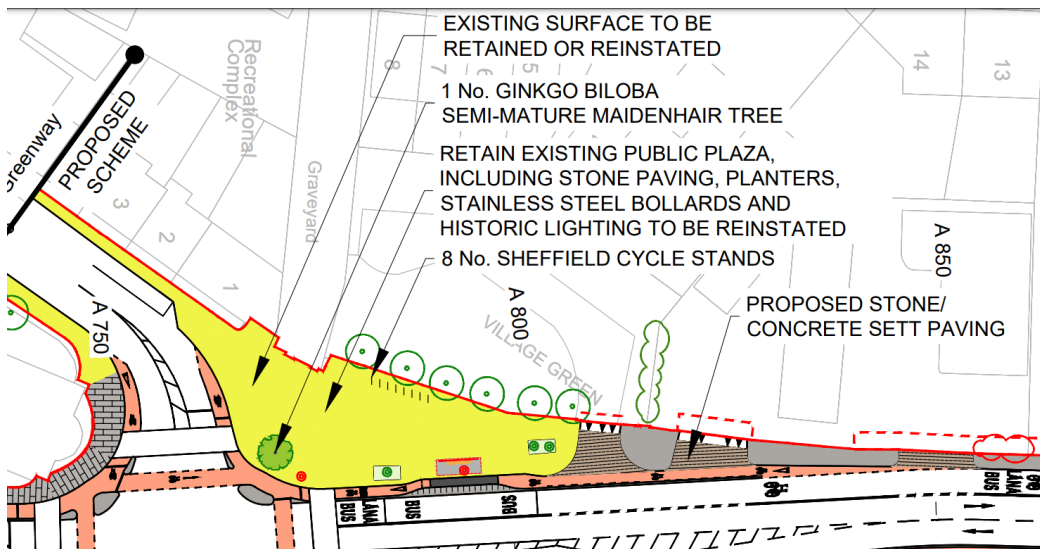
Landscaping General Arrangement, sheet 3 of 37
